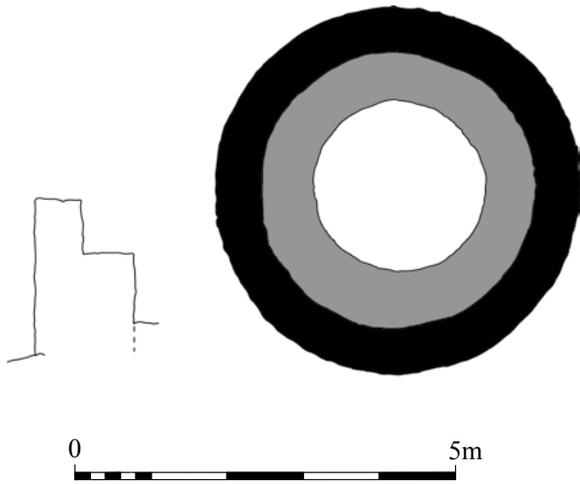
Watchtower at locus 36; measured sketch plan and section (scale 1:100).
